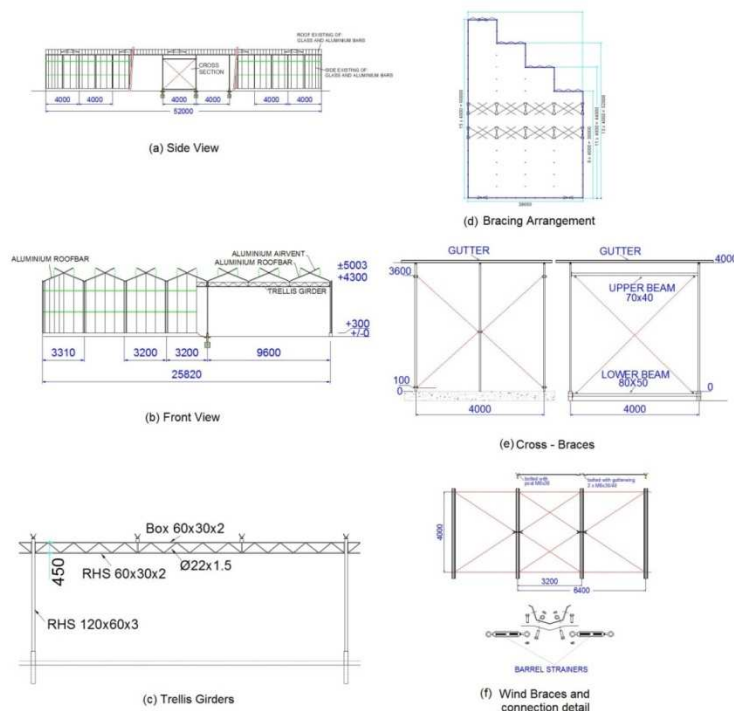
Typical drawings of a Venlo-type glass-covered greenhouse structure
